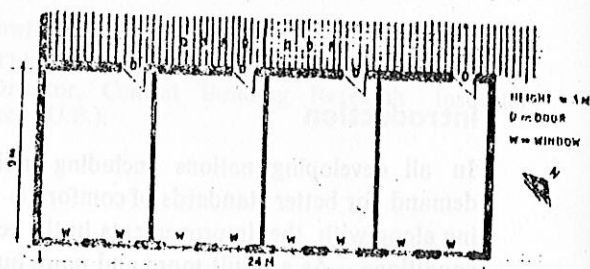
PLAN OF THE BUILDING MODULE OF ILLUSTRATIVE EXAMPLE
